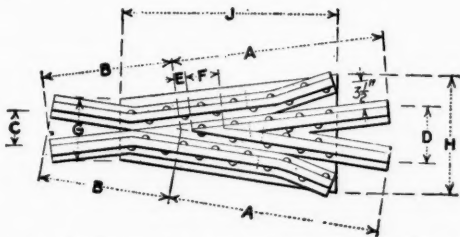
DIMENSIONS OF PLATE FROG OF 25- TO 60-LB. RAIL
